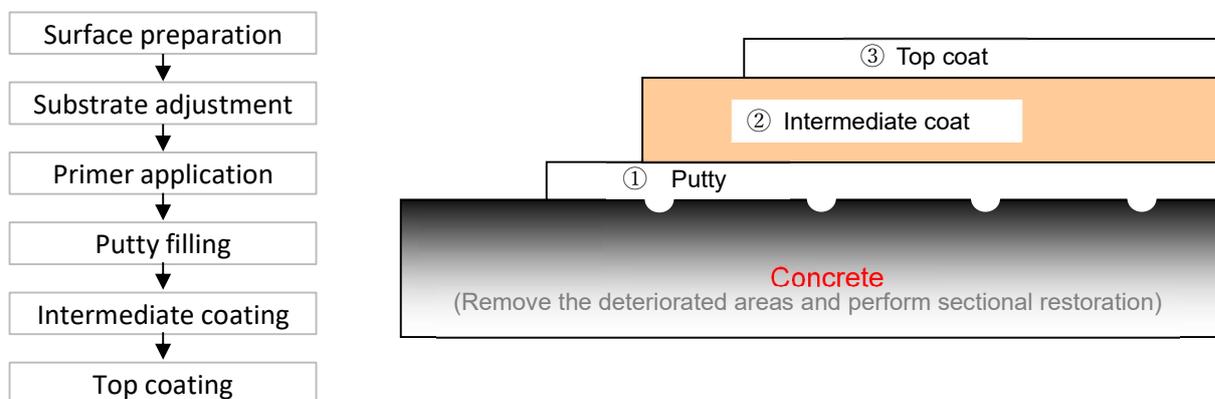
General construction flow and cross-sectional diagram of the surface coating method
